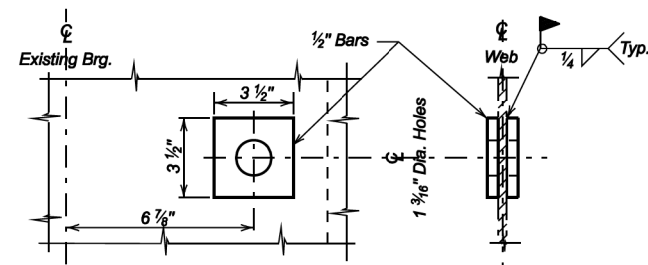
DETAILS OF DIAPHRAGM REMOVAL AT ABUTMENTS
